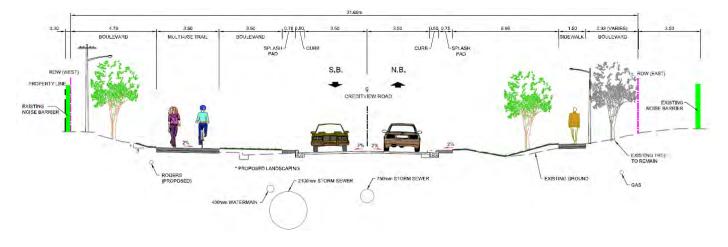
Typical Cross-Section – Preliminary Preferred Design
